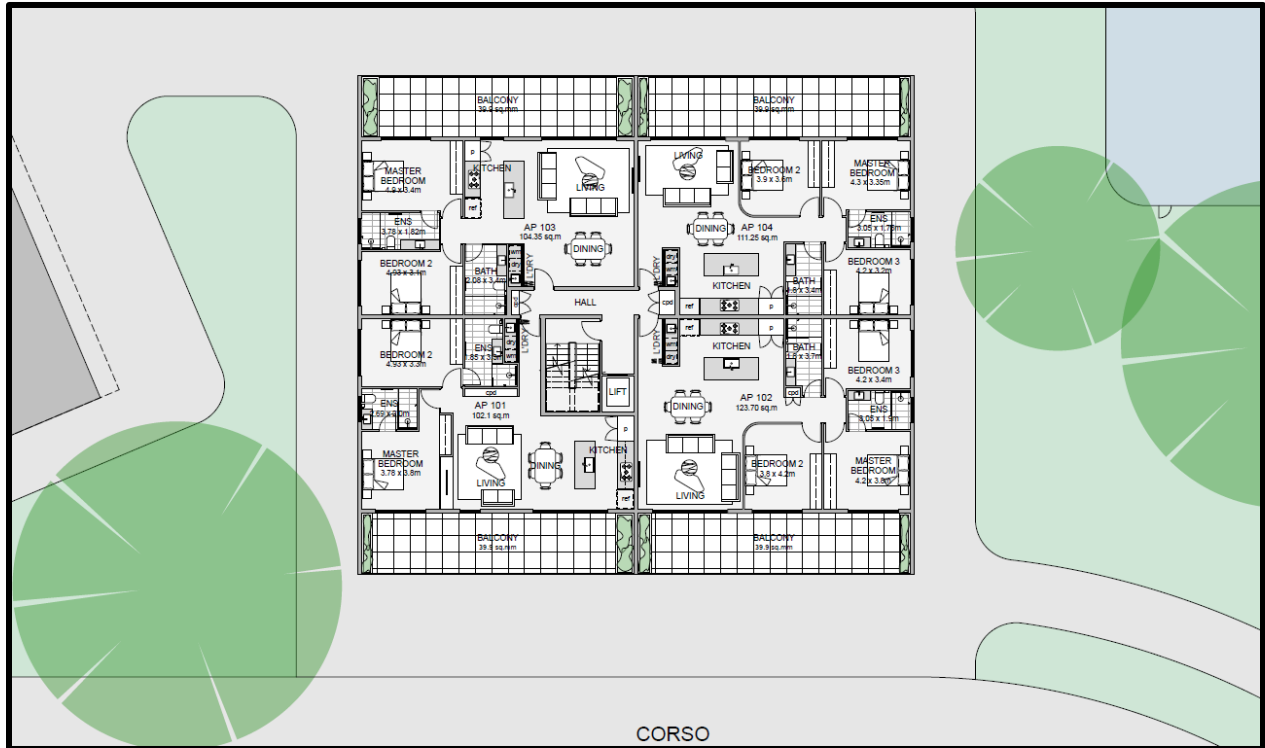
Typical Shop Top Housing First Floor (Source: Robert Harwood Architects)
